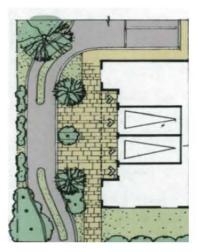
Curved pavement and landscape planting to reduce visual impact of driveway.
